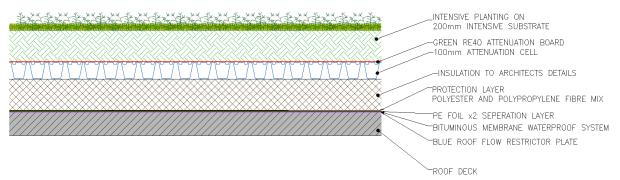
Typical Intensive Green/ Blue Roof Landscaping
